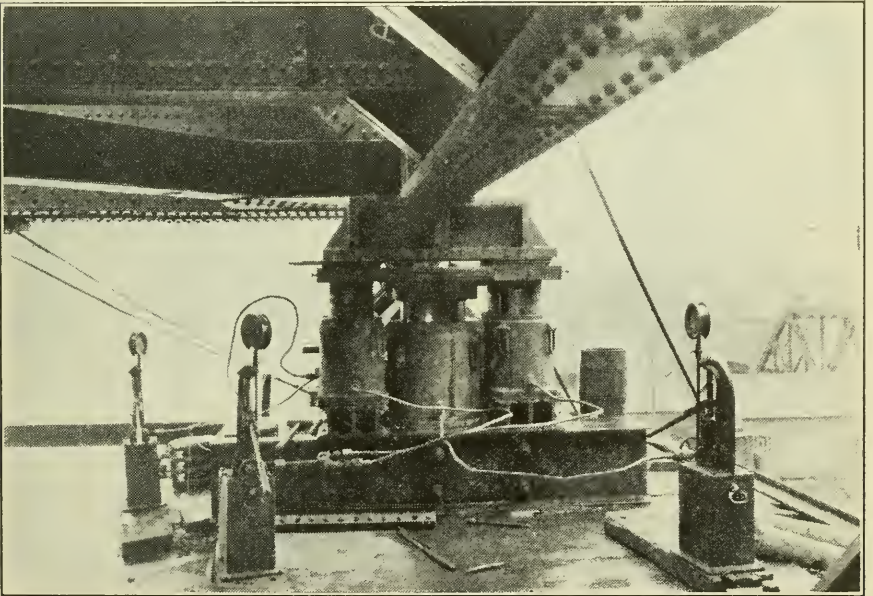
ADJUSTMENT OF KENTUCKY SPAN, SCIOTOVILLE BRIDGE, BY HYDRAULIC JACKS.
